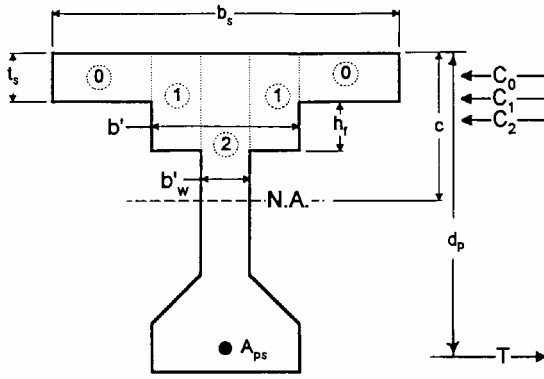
P-1 - General Beam Cross-Section
